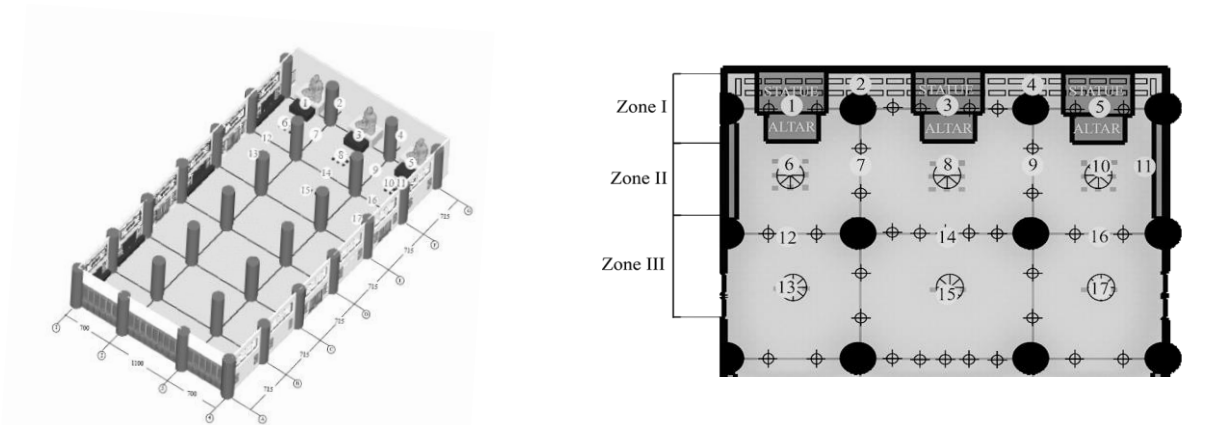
Plan and Isometric Great Maitreya Temple Baktisala Room (Source: Fortuna, 2021)
